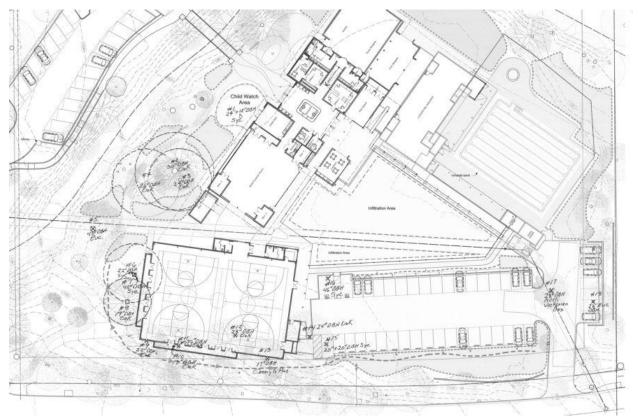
Full site plan was copied from a scaled plan. Because tree root zone overlays are difficult to see, the site has been broken up into three sections (see below)
